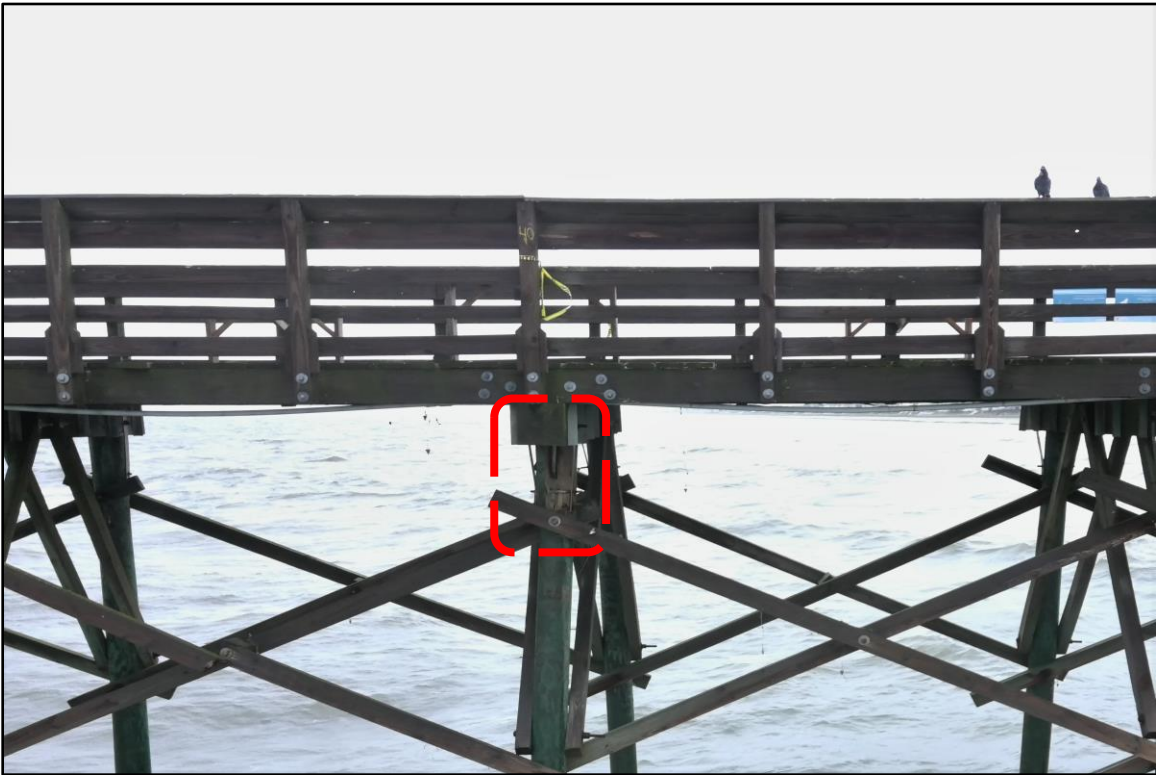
Pile 17A - 100% Non-Bearing pile, timber cap supported by steel fish plates
